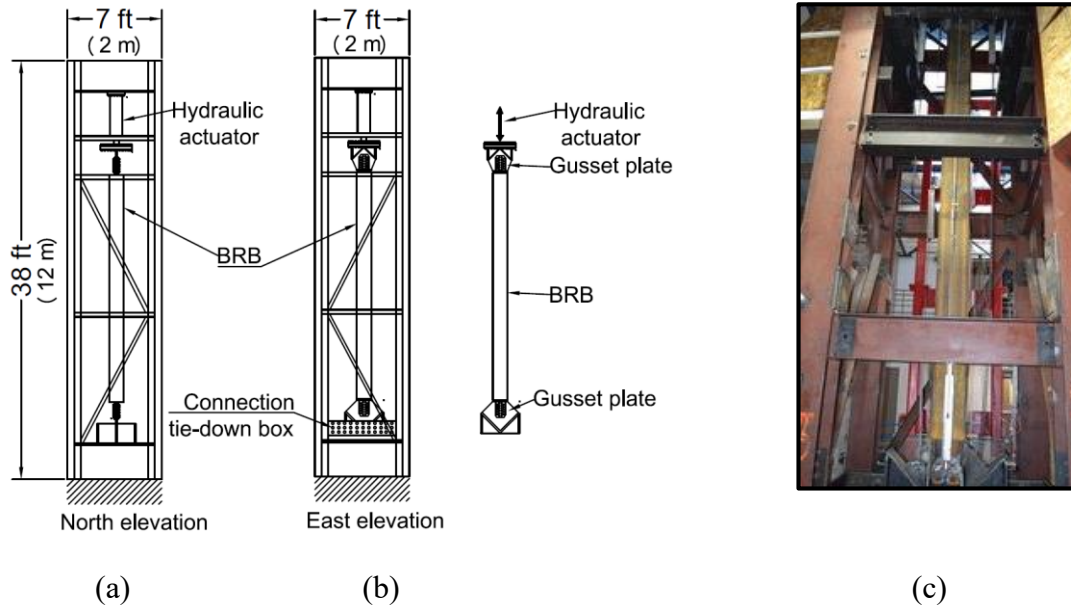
Test frame, (a) Side view, (b) Front view of frame and a BRB and (c) Photo of testing frame
